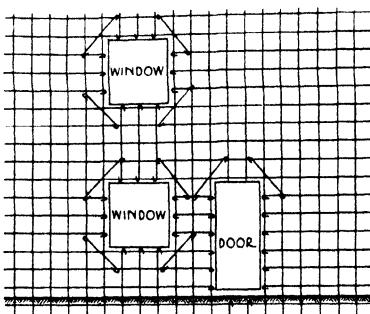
A.—ARRANGEMENT OF REINFORCEMENT FOR THIN WALLS
